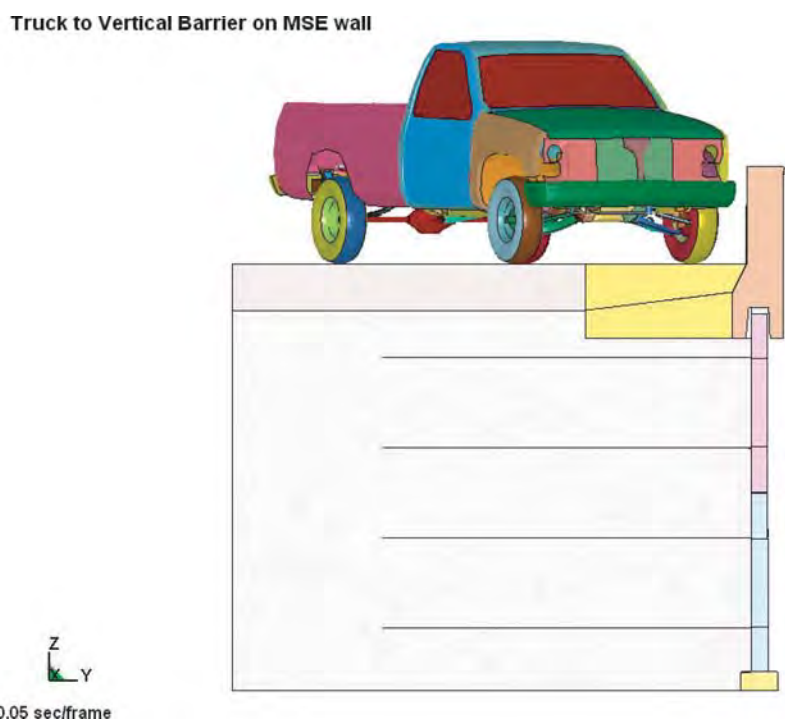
Downstream view of model showing profile of barrier and embedded soil strips.
